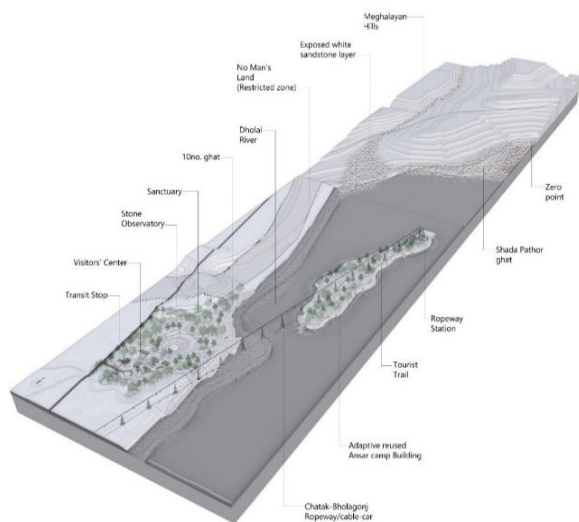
Aerial view of the proposed revitalization master plan of Bholagonj Ropeway Area (Source: Author)
